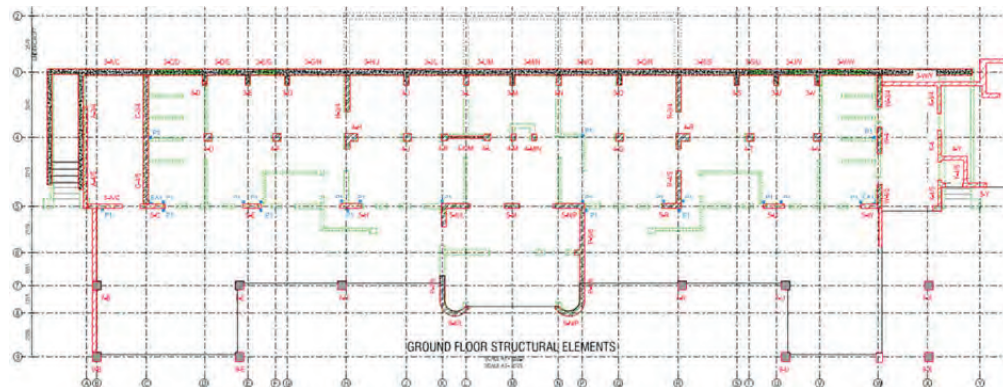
ground floor structural elements. Note that green walls are original brick walls that have been removed.
